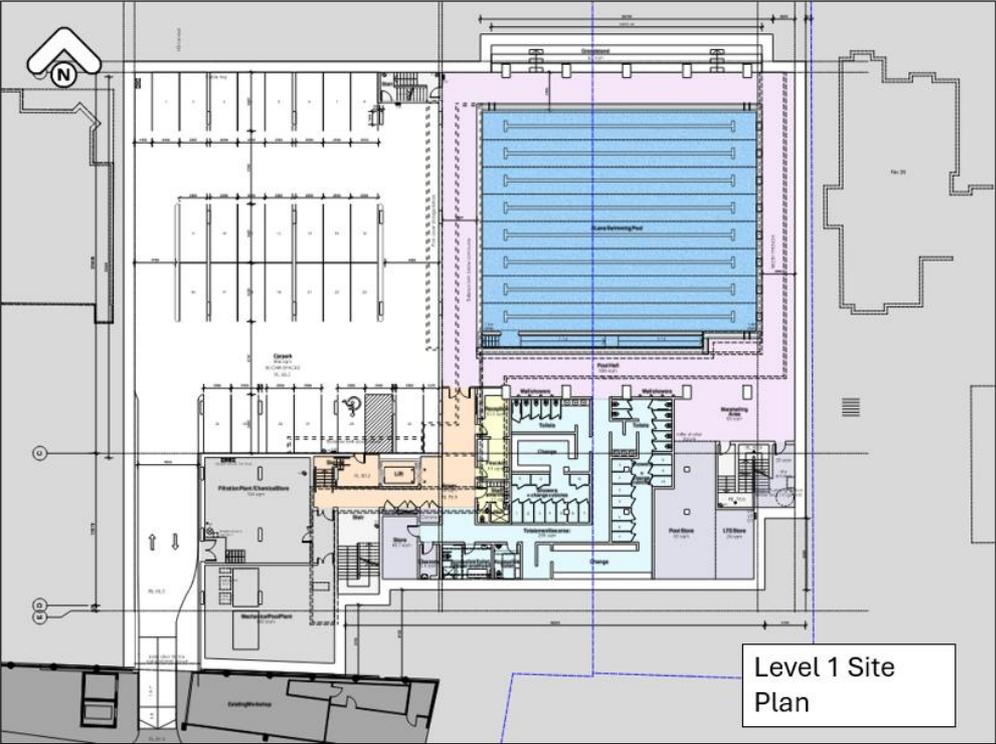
Level 1 Floor Plan of the Swell Centre Development
